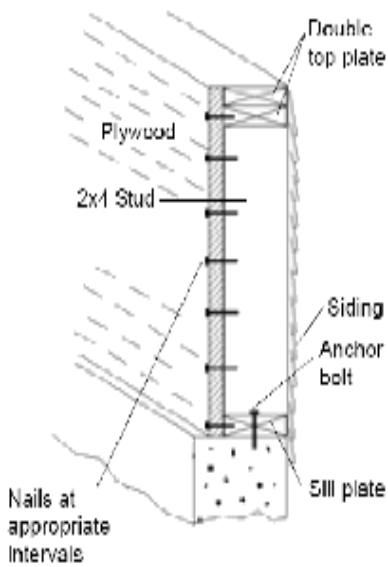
Plywood or diagonal sheathing strengthens weak cripple walls. If your home has a cripple wall between the foundation and the first floor, and the wall is not braced with plywood or diagonal sheathing, the house may fall or shift off its foundation during an earthquake.
